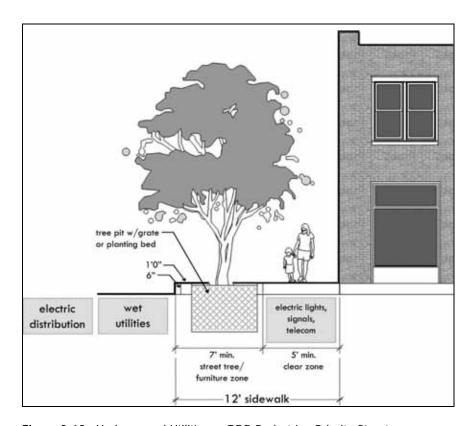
Underground Utilities on TOD Pedestrian Priority Street
